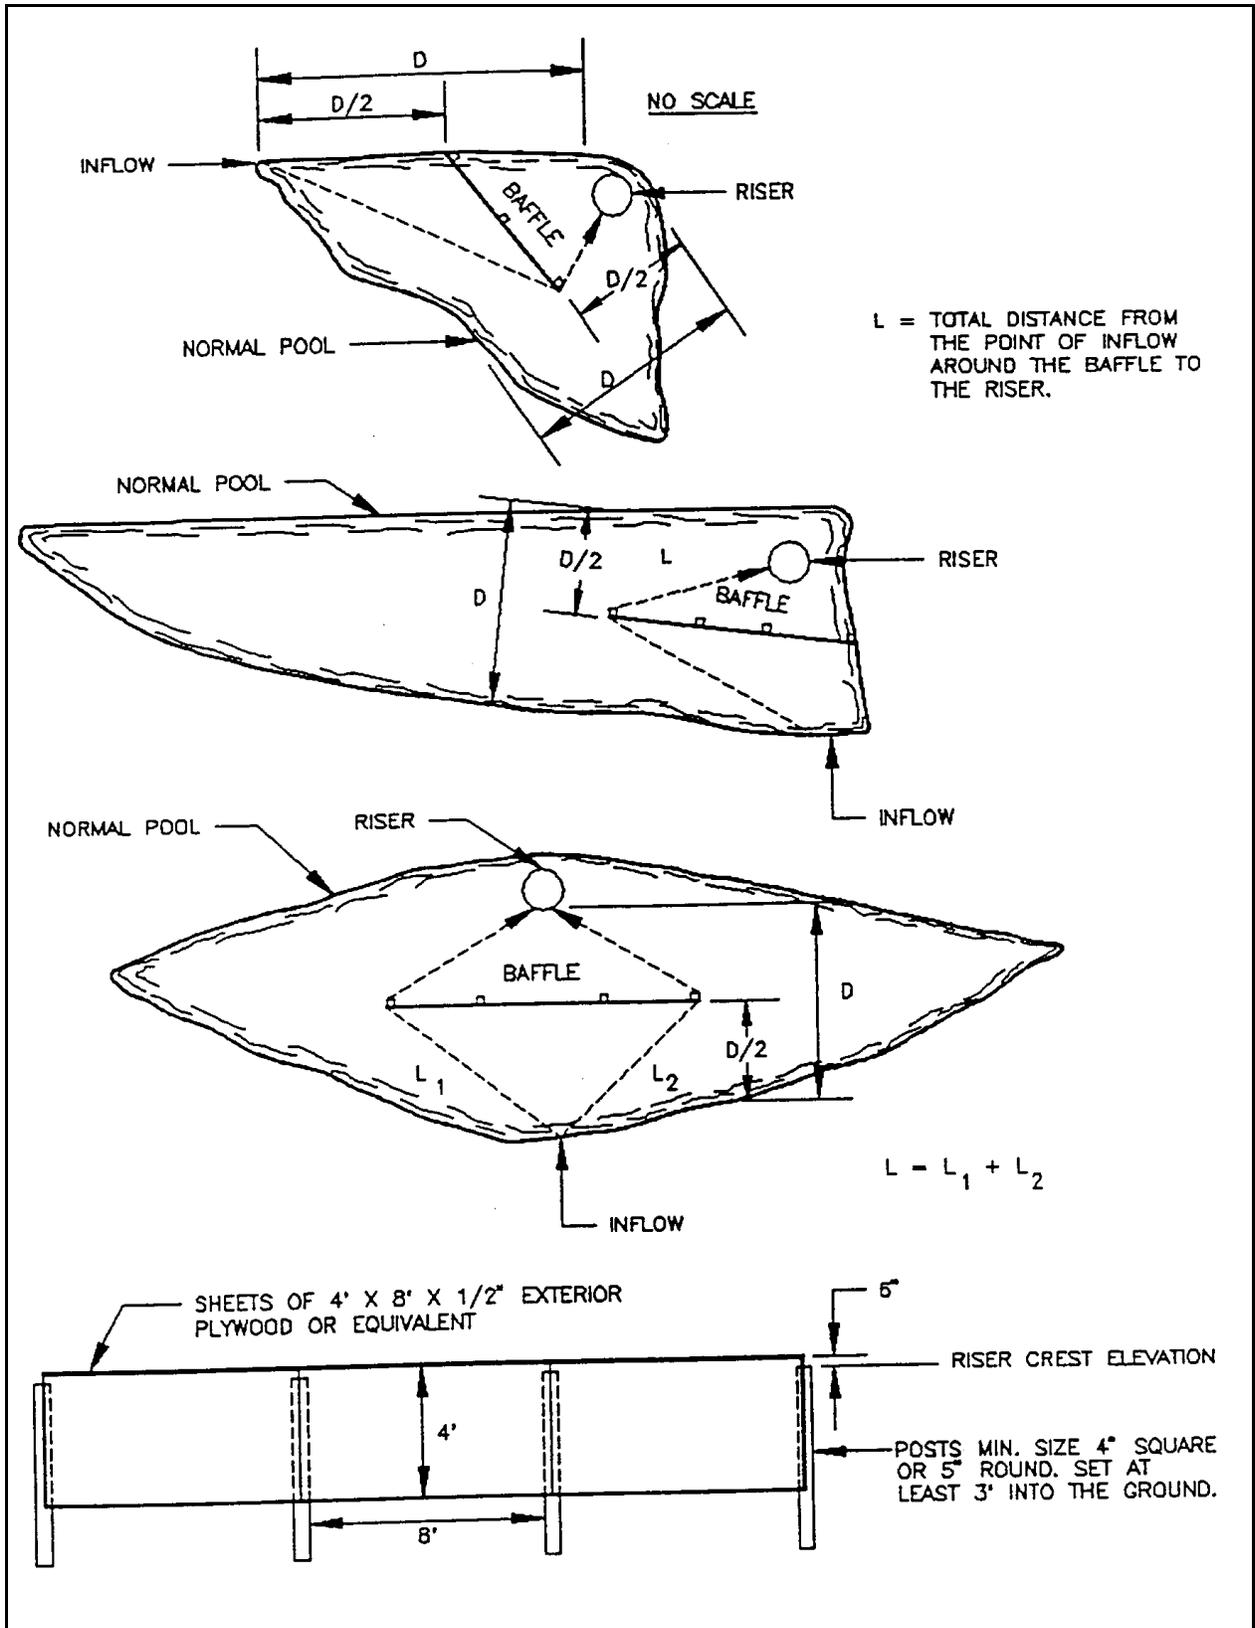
Example Plan Views of Baffle Locations in Sediment Basins
